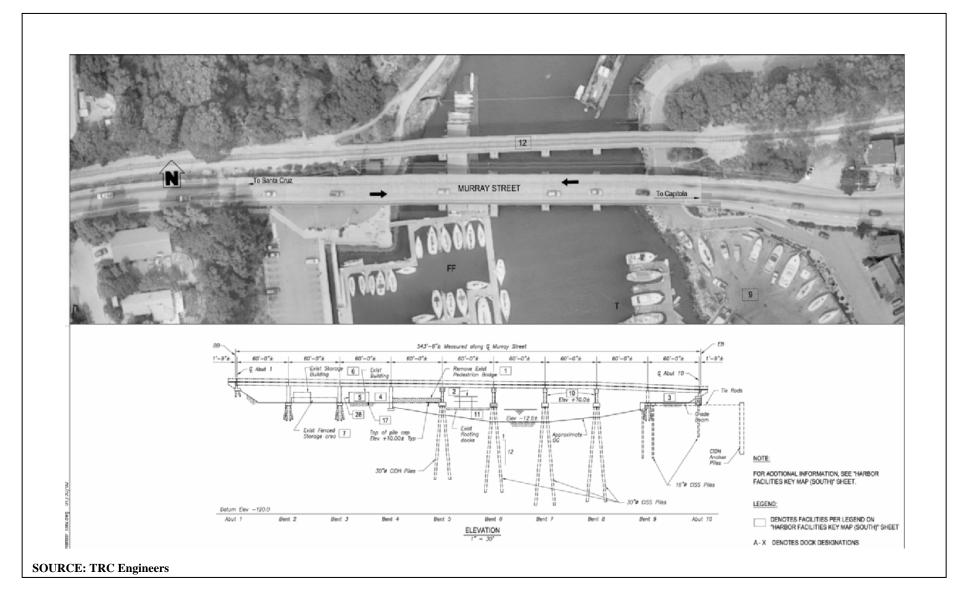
Cross Section of the Murray Street Bridge (# 36C-0108) in the City of Santa Cruz, County of Santa Cruz, CA.
